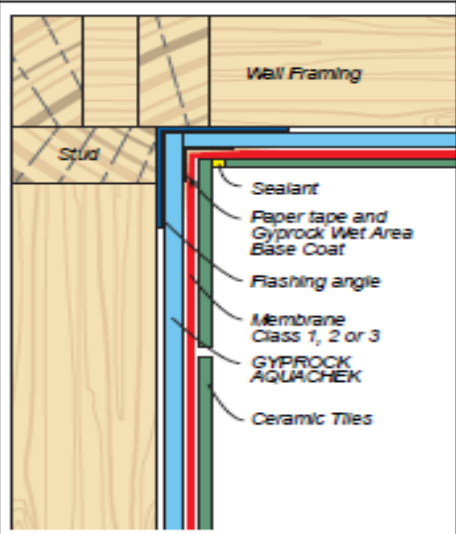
INTERNAL CORNER DETAIL - CLASS 2 MEMBRANE
